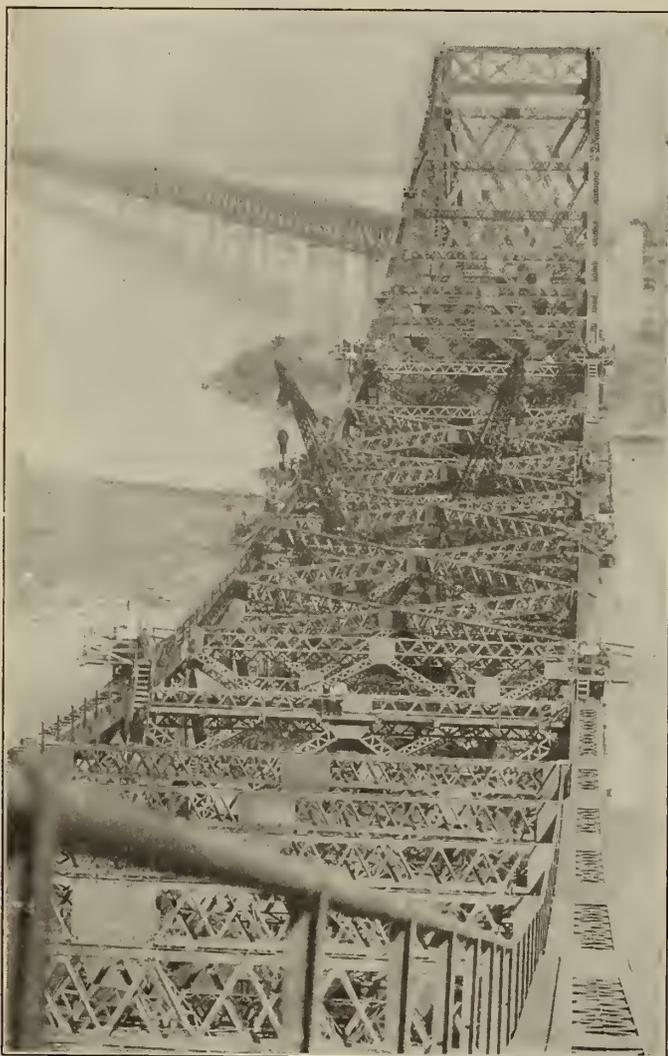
Main Span, Centre Section—View of Top of Suspended Span just prior to Closure.
